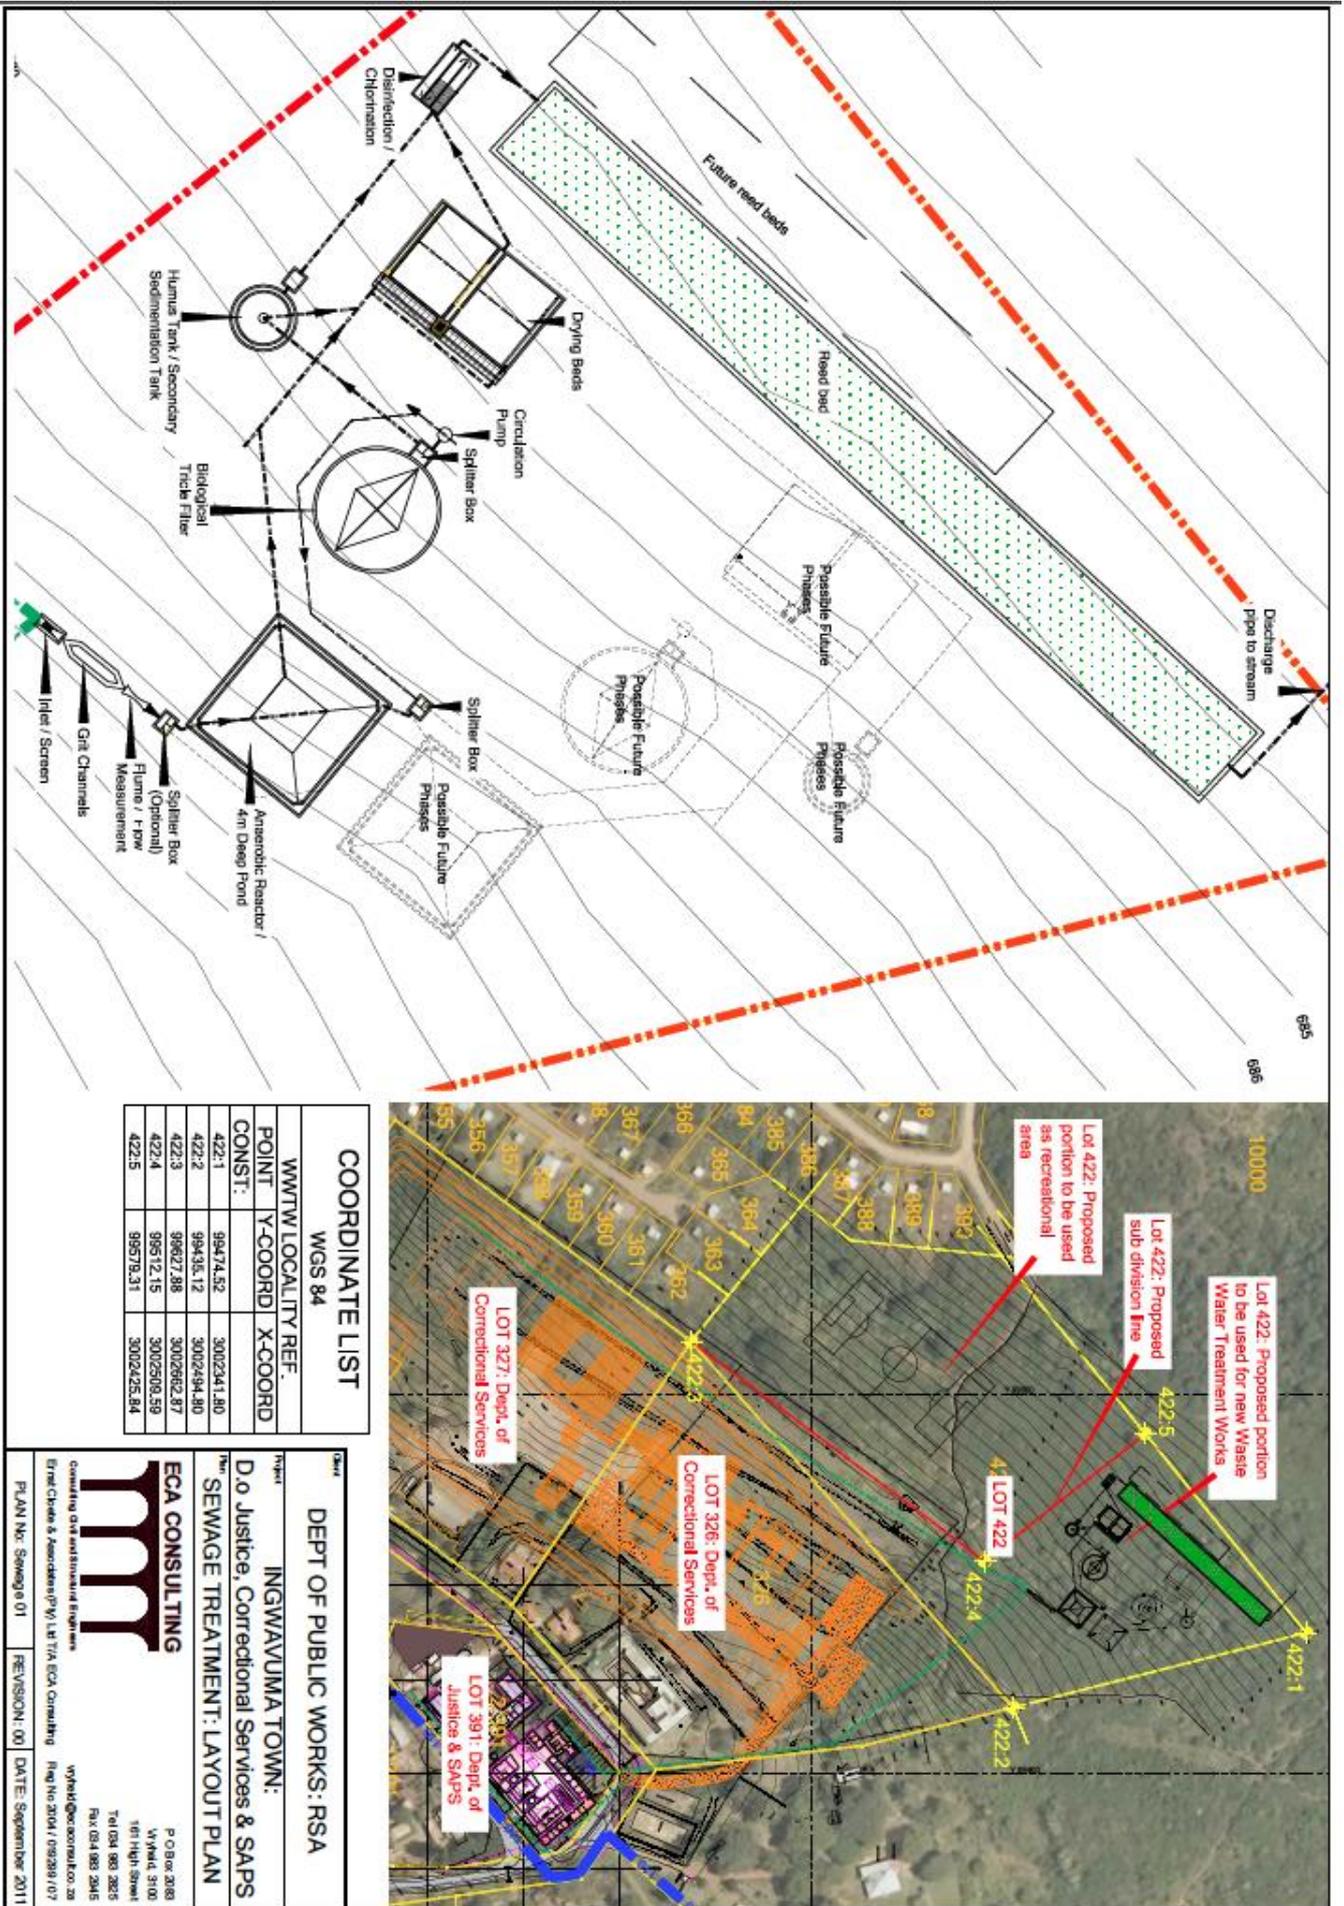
Layout Plan for proposed sewage treatment facility situated on periphery of government facility in Ingwavuma town.
